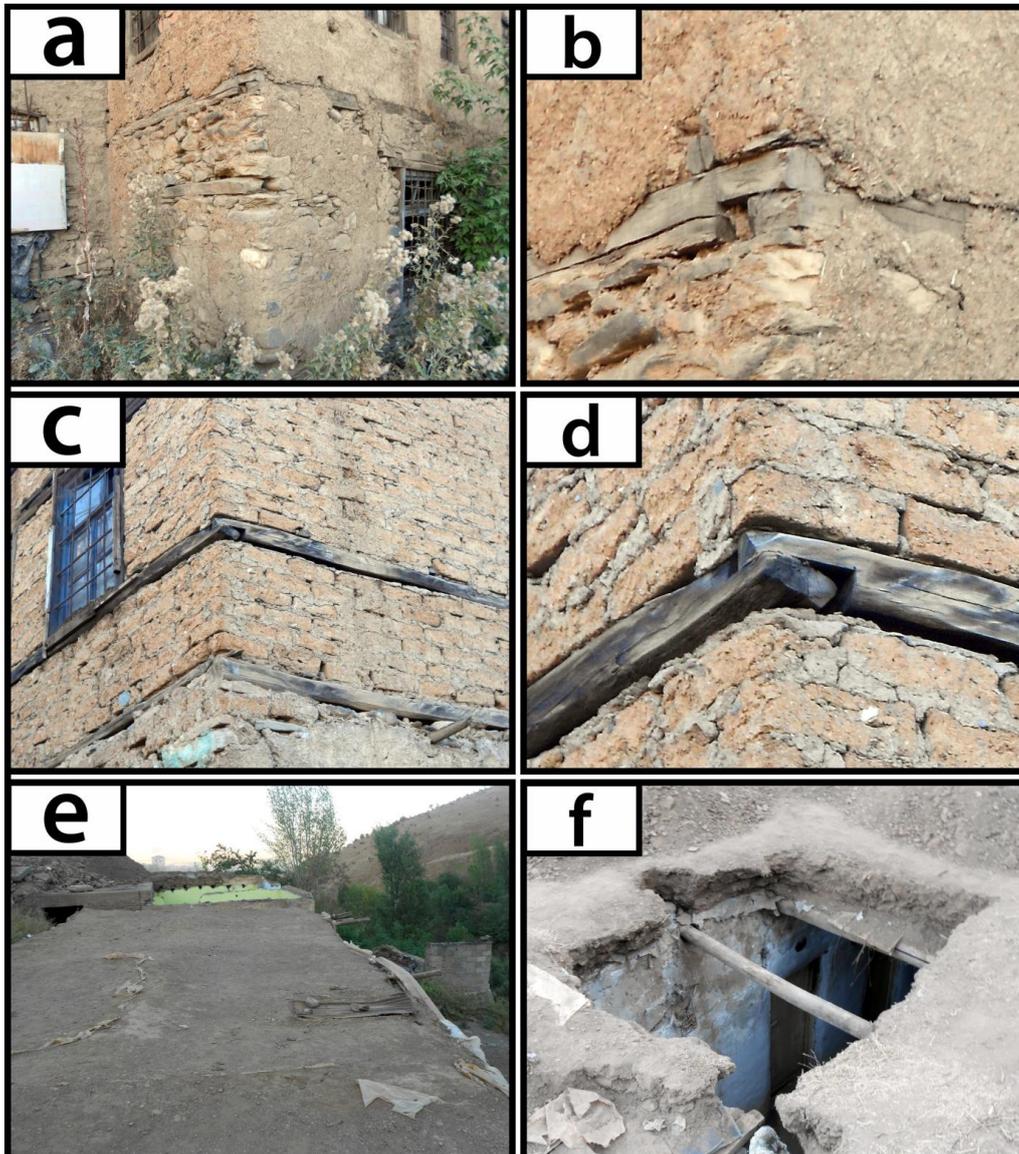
Construction systems and structural details of traditional houses; a) ground floor main walls, b) corner joints of wooden beams, c, d) corner joints of adobe bricks and wooden beams observed in upper floor walls, e) earthen roofs of residential buildings, f) section of a collapsed earthen roof and ceiling beams.
